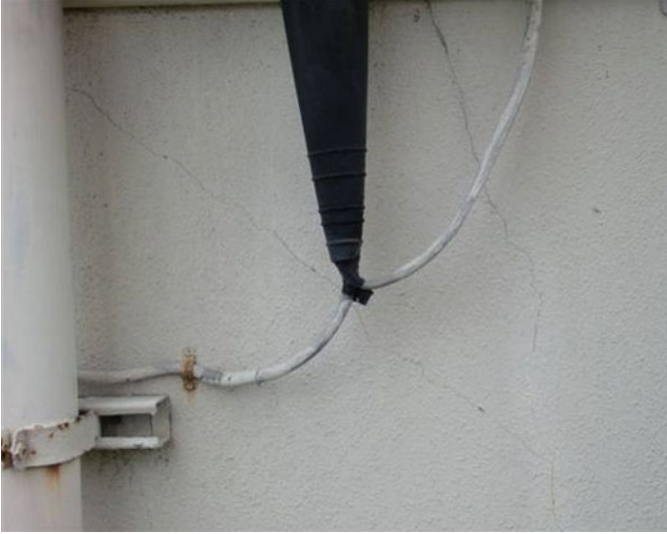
Spalling of finishing mortar of foundation beam at west side
